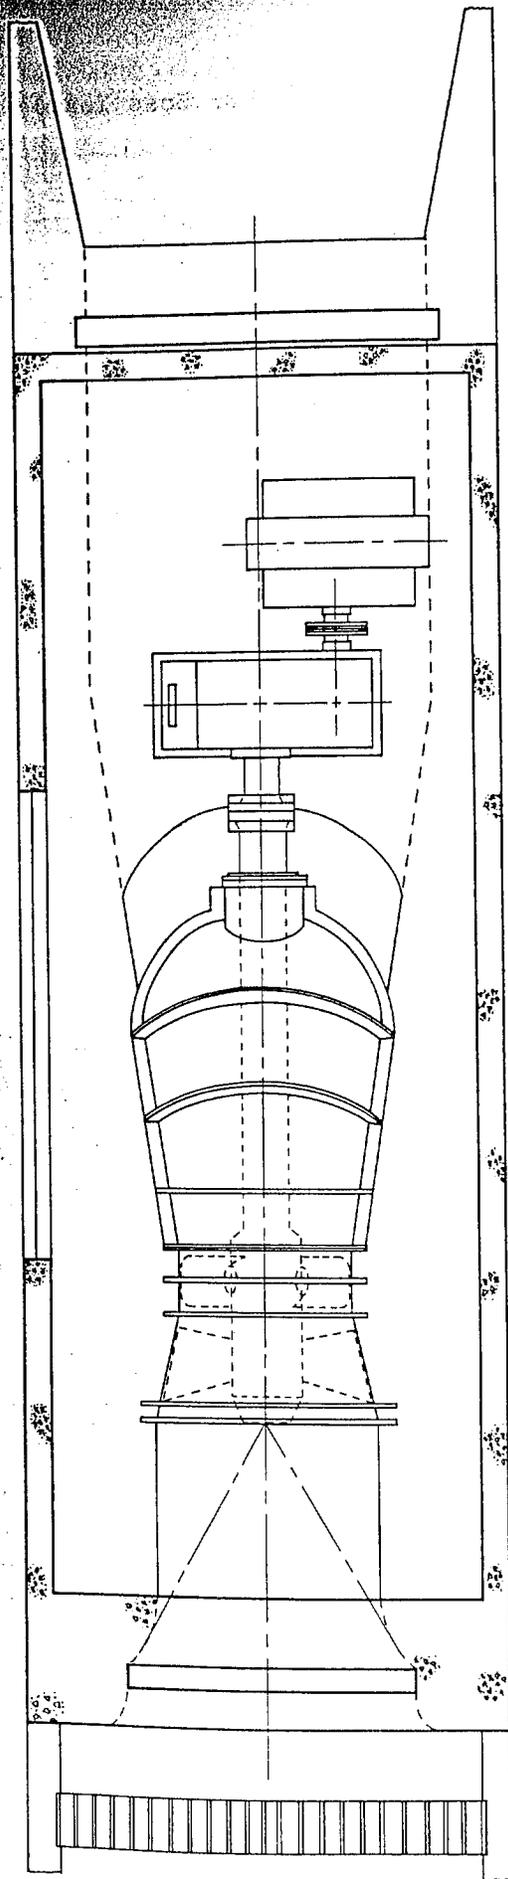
Section view of Alternative A: One 2000 mm adjustable blade horizontal Tube turbine.
